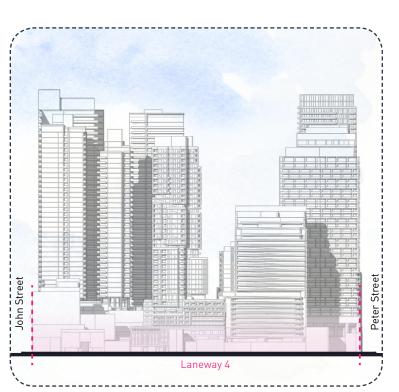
Enlarged Site Section A.C; 2014-, section
